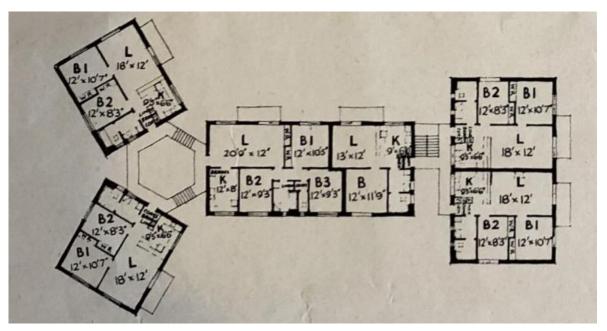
Floor plan layout of the six flats in each group of the first stage of Hotham Gardens Source: *Cross-Section*, University of Melbourne Department of Architecture, No. 100, 1 February 1961, p. 3.
